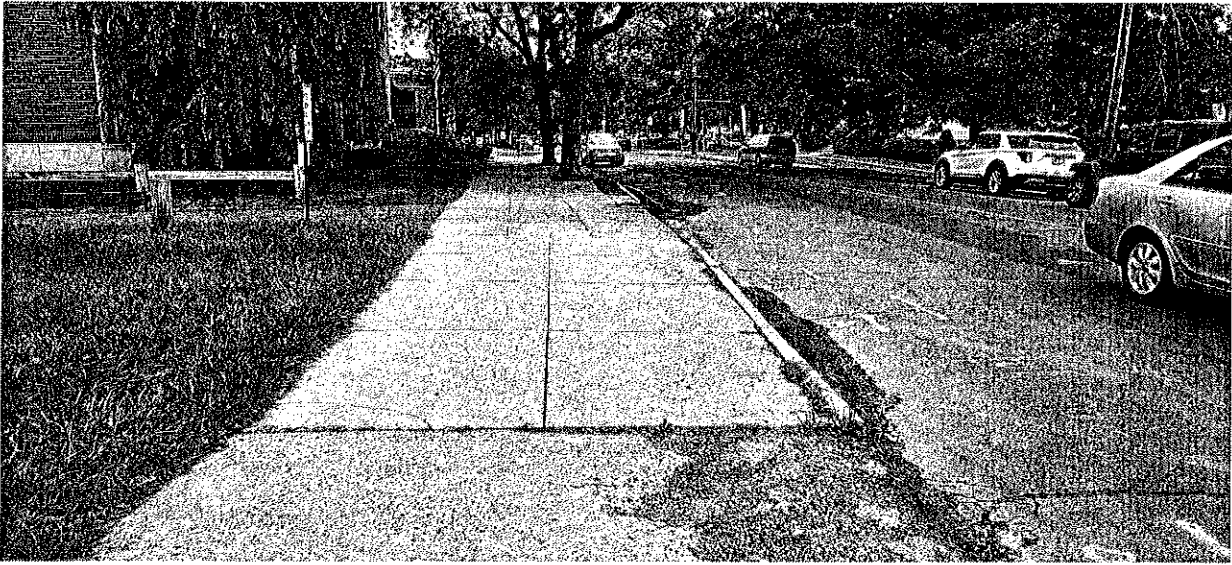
Spalling concrete sidewalk and heaving sidewalk at trees.
